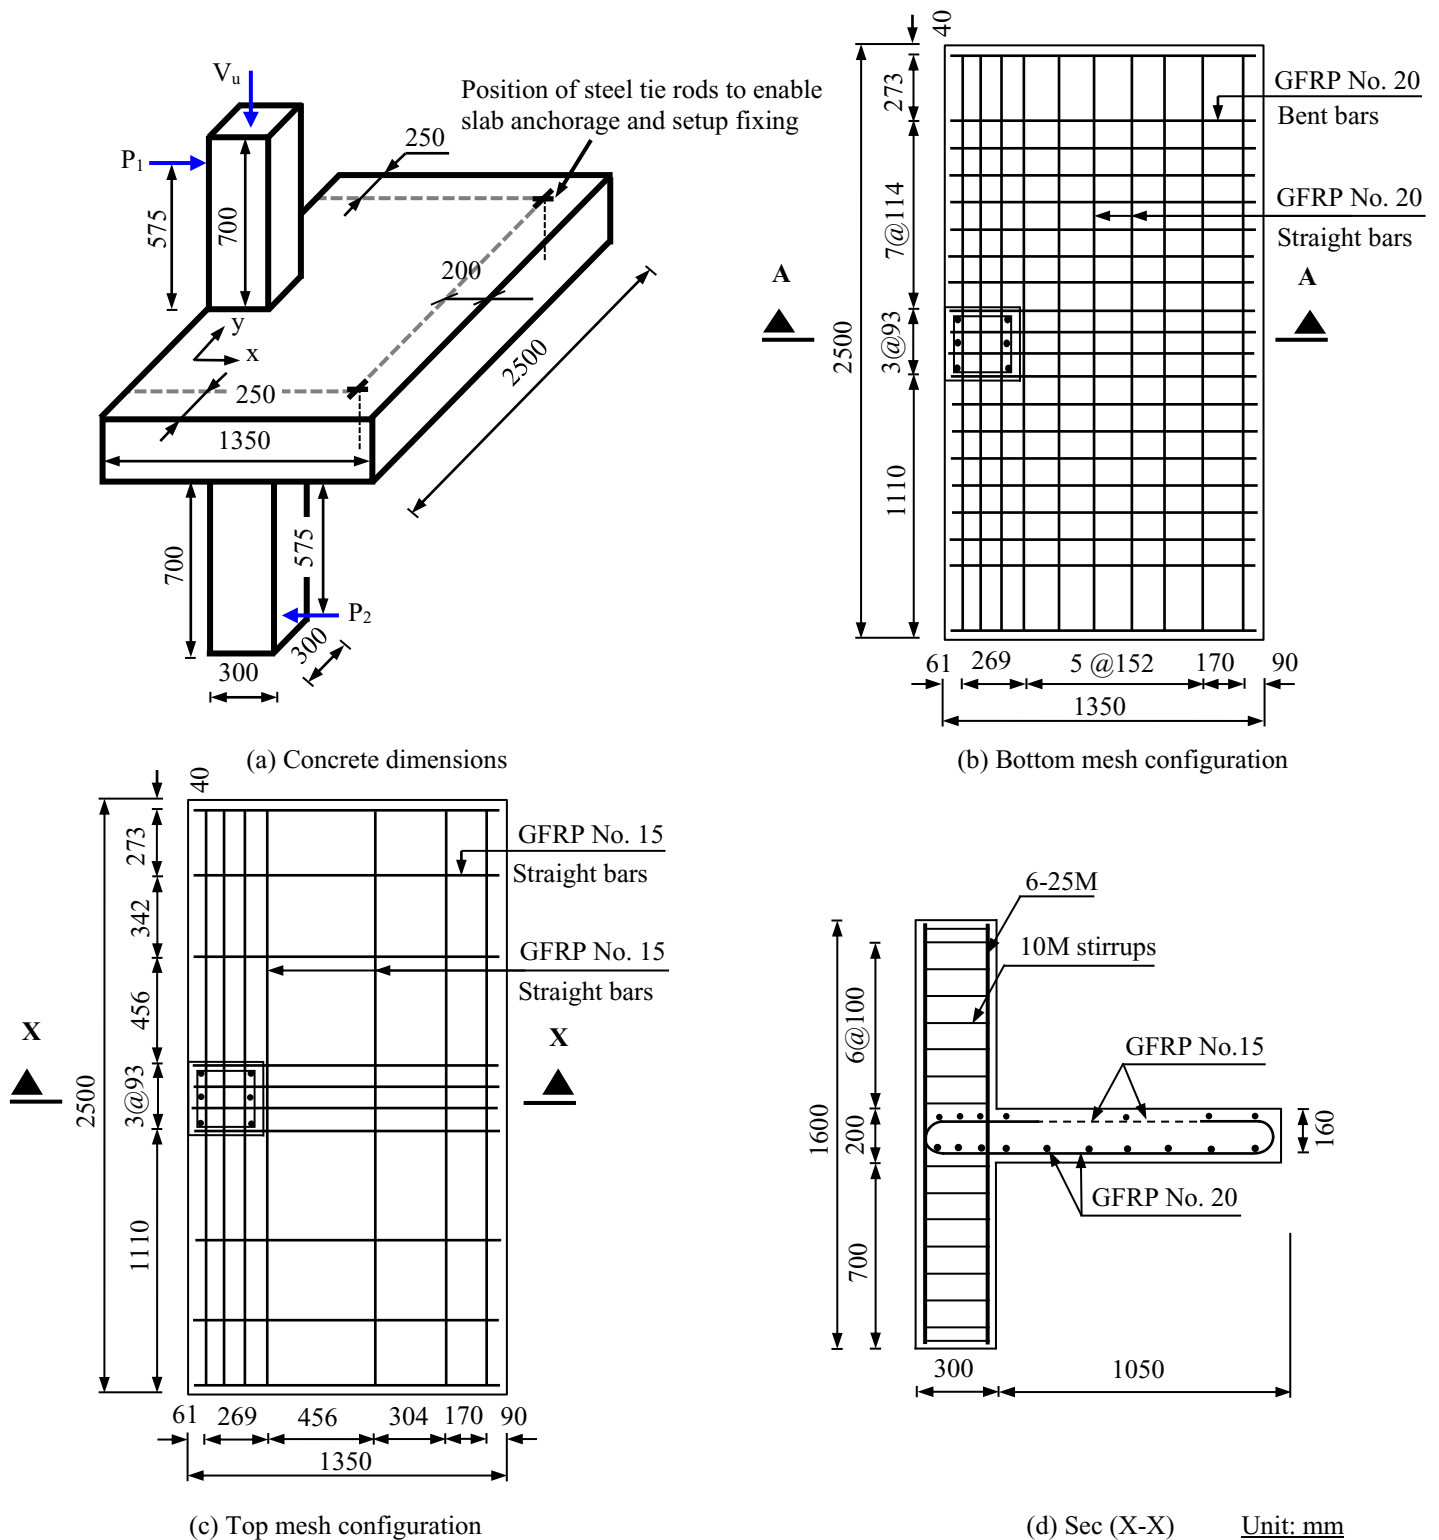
Flexural reinforcement details of specimens with shear reinforcement
